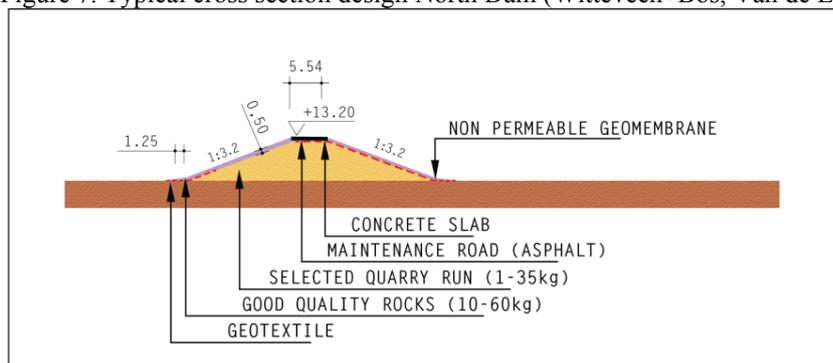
Typical cross section design North Dam (Witteveen+Bos, Van de Enden, 2014)
